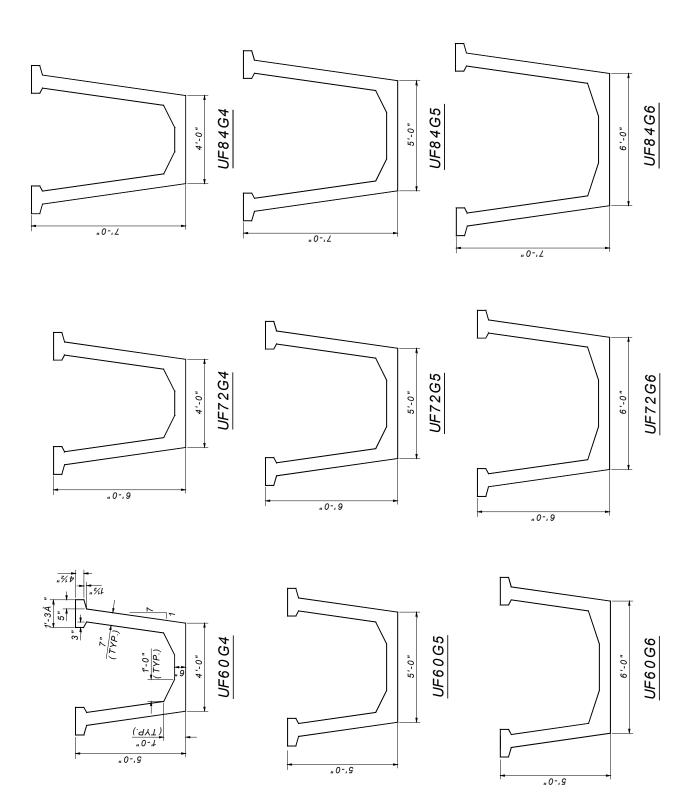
Standard Precast Trapezoidal Tub Girders with Top Flanges
